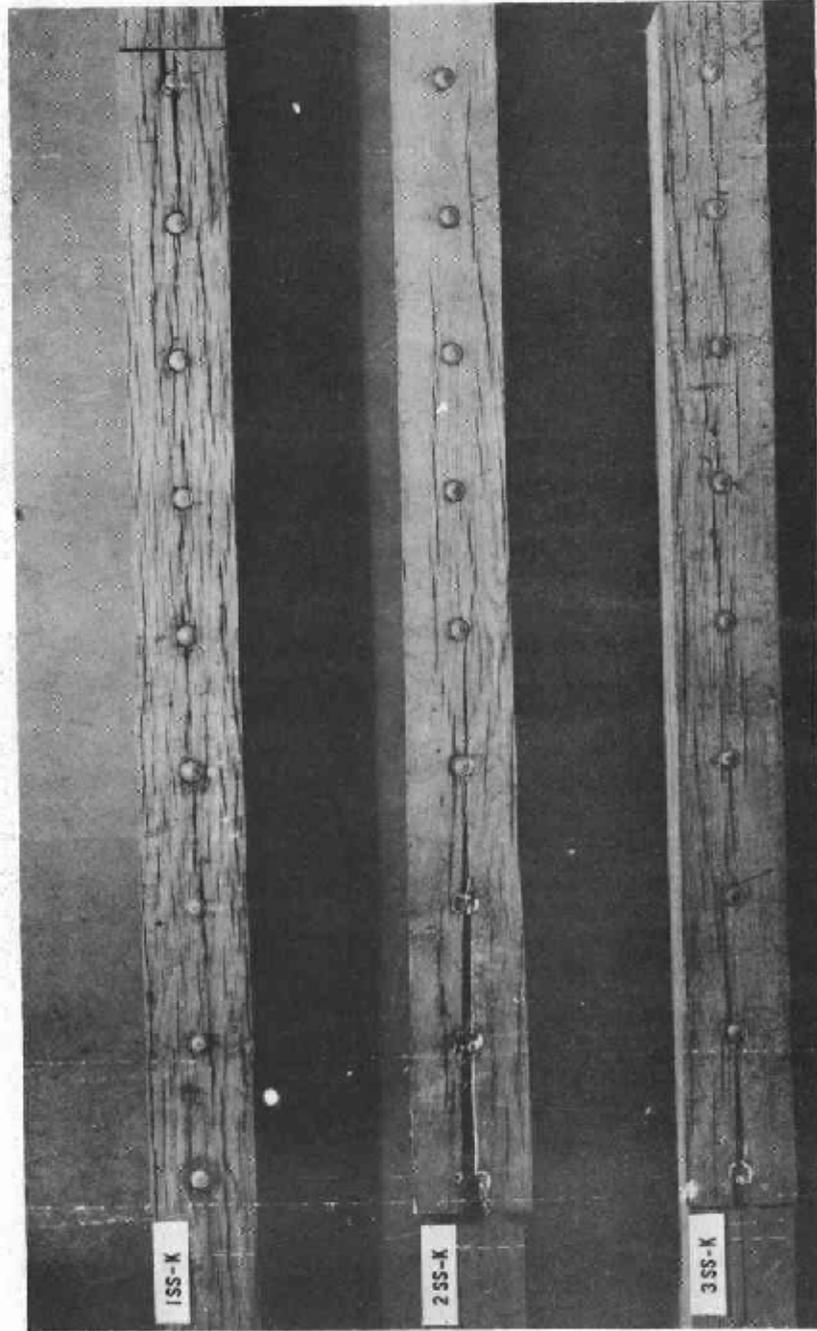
Bottom view of solid keel sections with bolted plain scarf joints after test, showing the crushing and splitting of the wood at the bolts near the end of the joint on the tension side.
